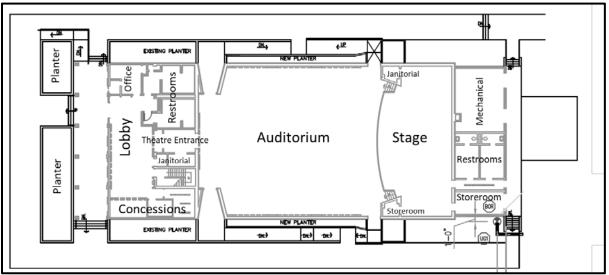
Beale Air Force Base Building 2474 (Theatre) Floorplan.
